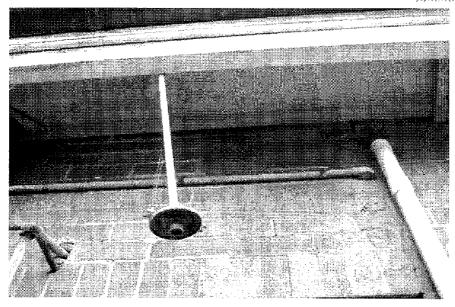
Example of asbestos cement sheeting located above the rear entrances to the commercial tenancies.
